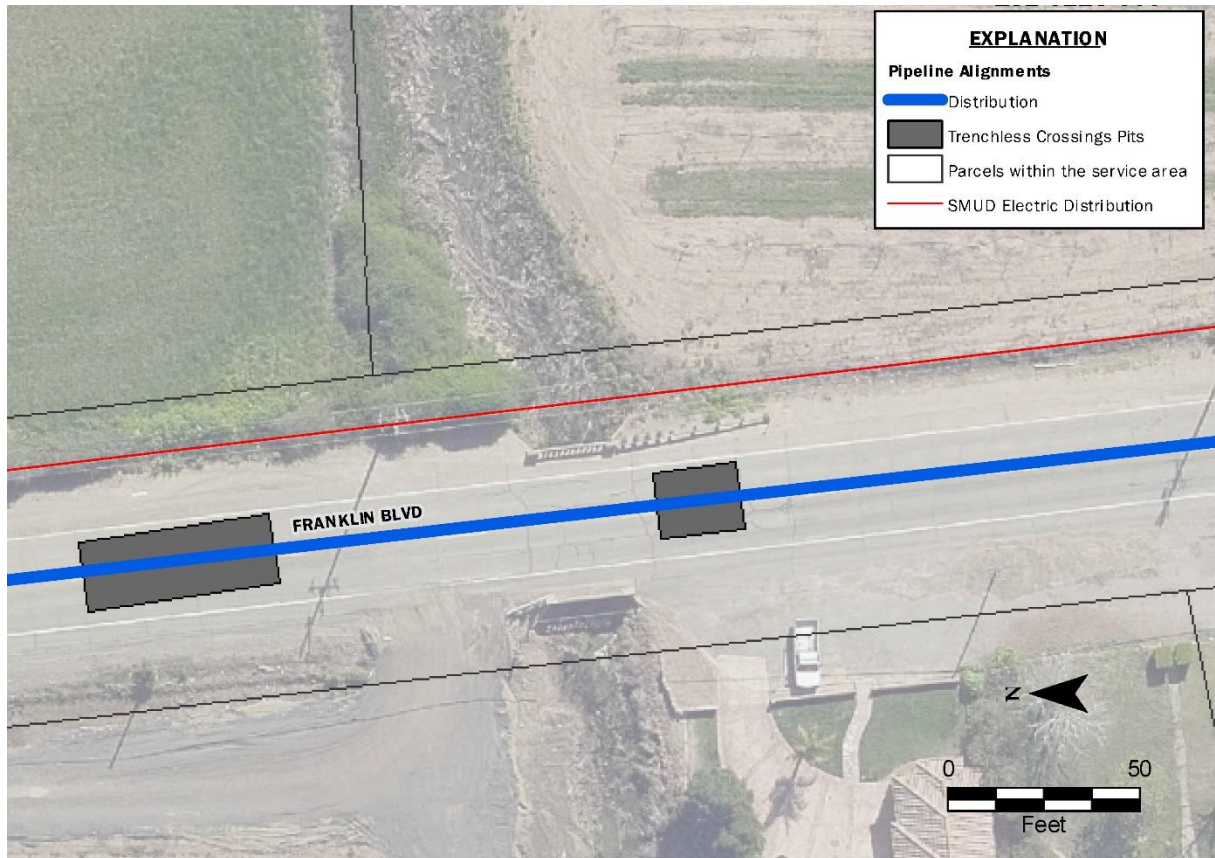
Proposed Trenchless Crossing of the South Fork of Stone Lake Creek at Franklin Boulevard
